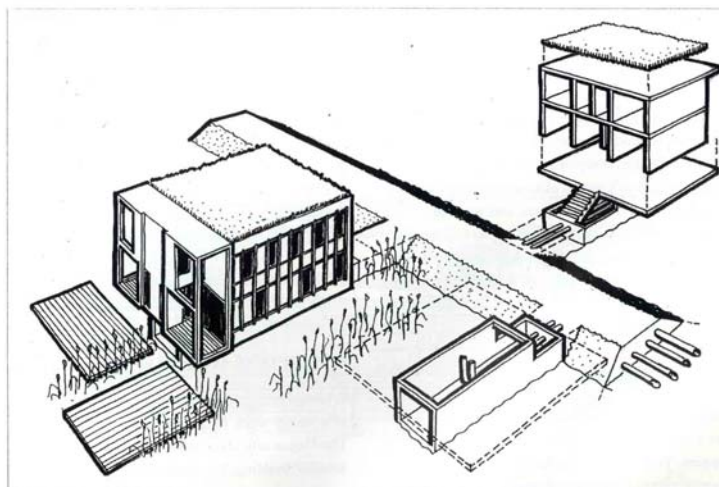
Isometry of all buildings, from plug-in to concrete slabs to wooden facades
